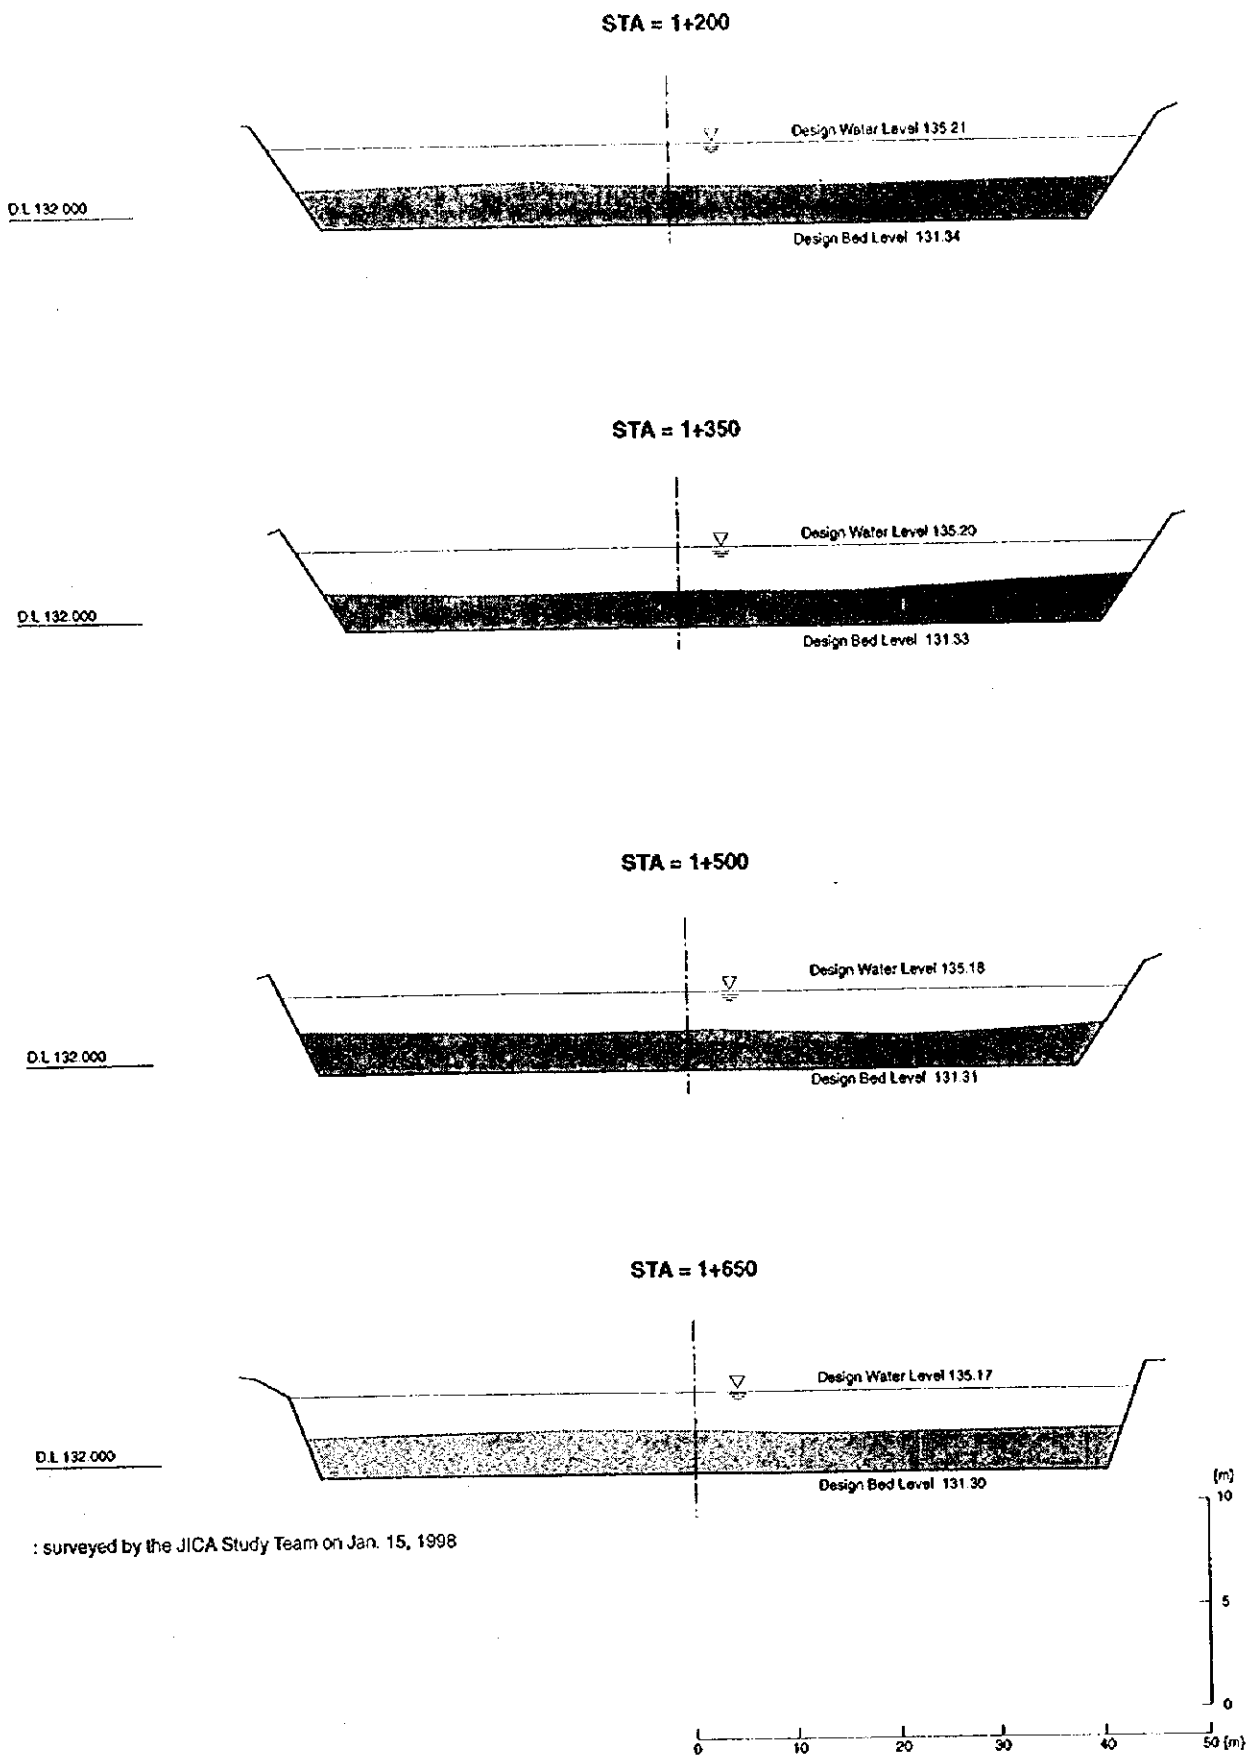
Cross Section of D.G. Khan Canal at Taunsa Barrage (3/4)
